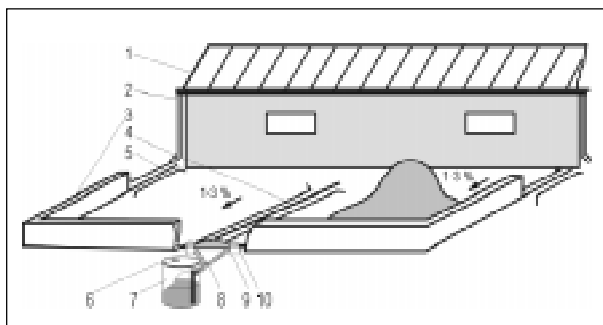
Scheme for the storage of litter manure: 1- stable, 2 - water-spouts, 3 - wall, 4 - elevated storage floor, 5 - elevated edging, 6 - tank, 7 - lid, 8 - pipe, 9 - grid, 10 - pit for sediments.
